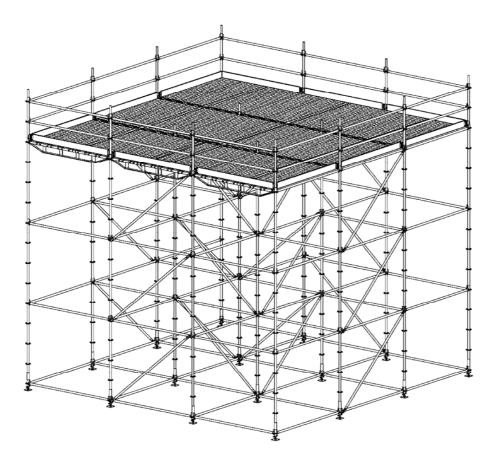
Typical interior scaffolding as surface scaffolding (access not shown)
